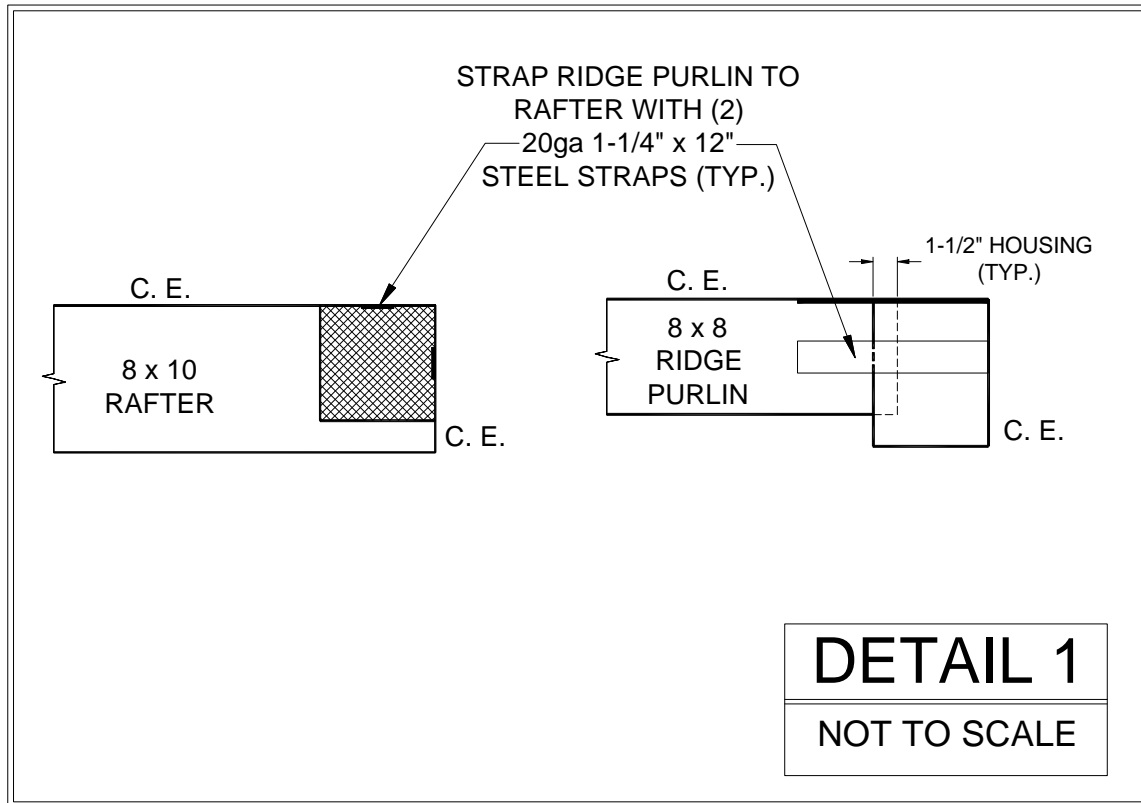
Example of typical end rafter to ridge purlin joint consisting of a housing cut into the rafter into which the ridge purlin fits and is held in place with two steel straps. (C. E. indicates critical edge, a layout reference edge.)
